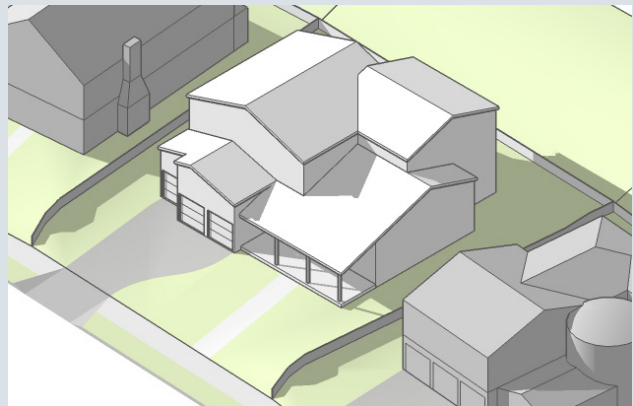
Project with open front yard along sidewalk and fences and retaining walls with minimal impact on views from adjoining properties
